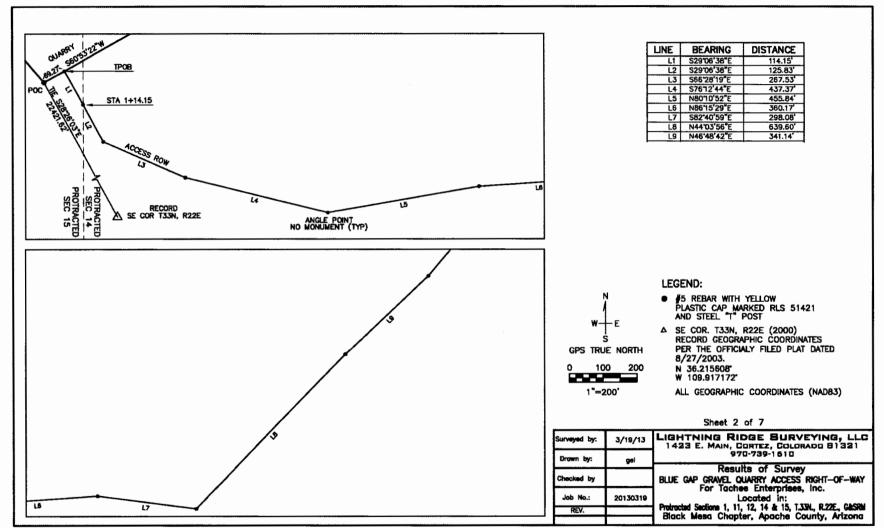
Proposed Access Road ROW plat (Page 1 of 6).
